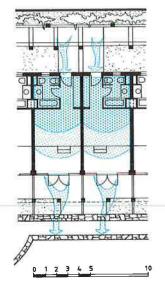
Plan of guest room module showing cross ventilation and daylighting
